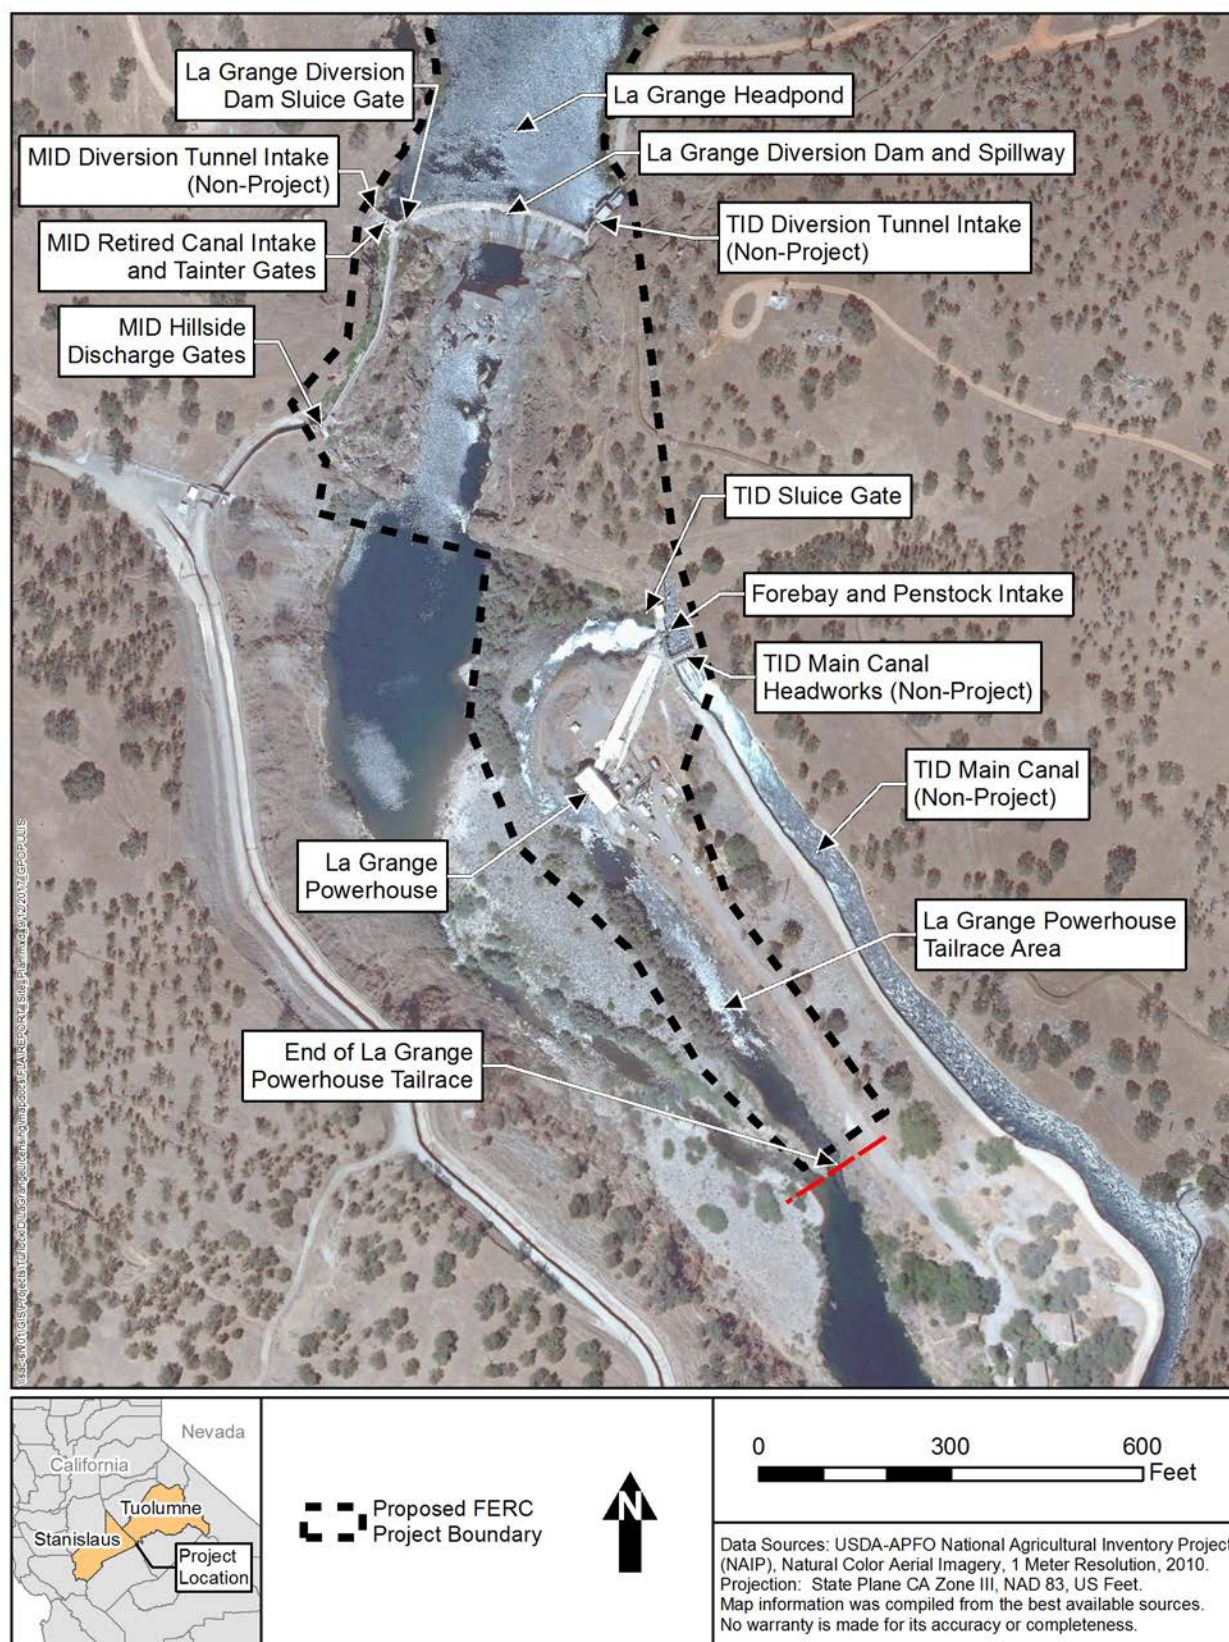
La Grange Project site plan, showing project and non-project facilities.
